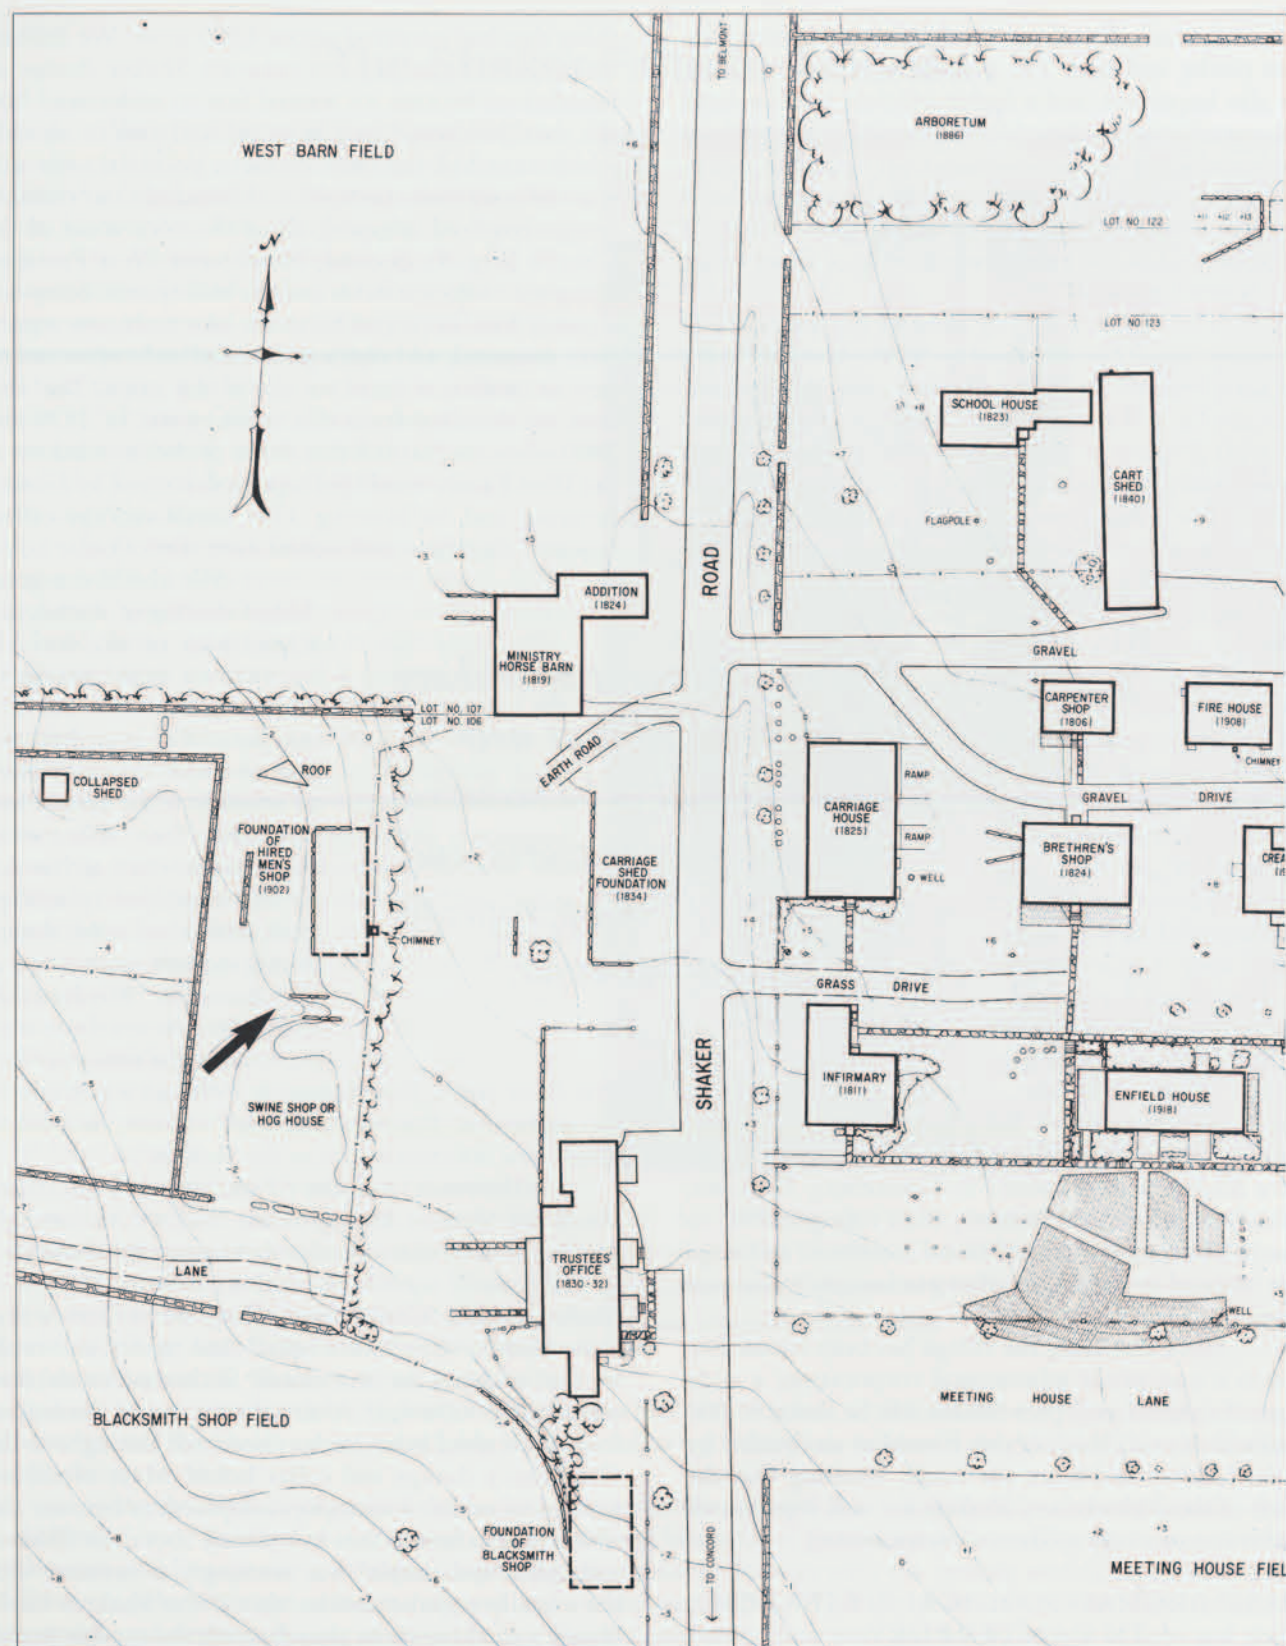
A SECTION OF A MODERN PLAN OF THE CHURCH FAMILY AT CANTERBURY SHAKER VILLAGE (location of Hog Heaven excavation arrowed).
